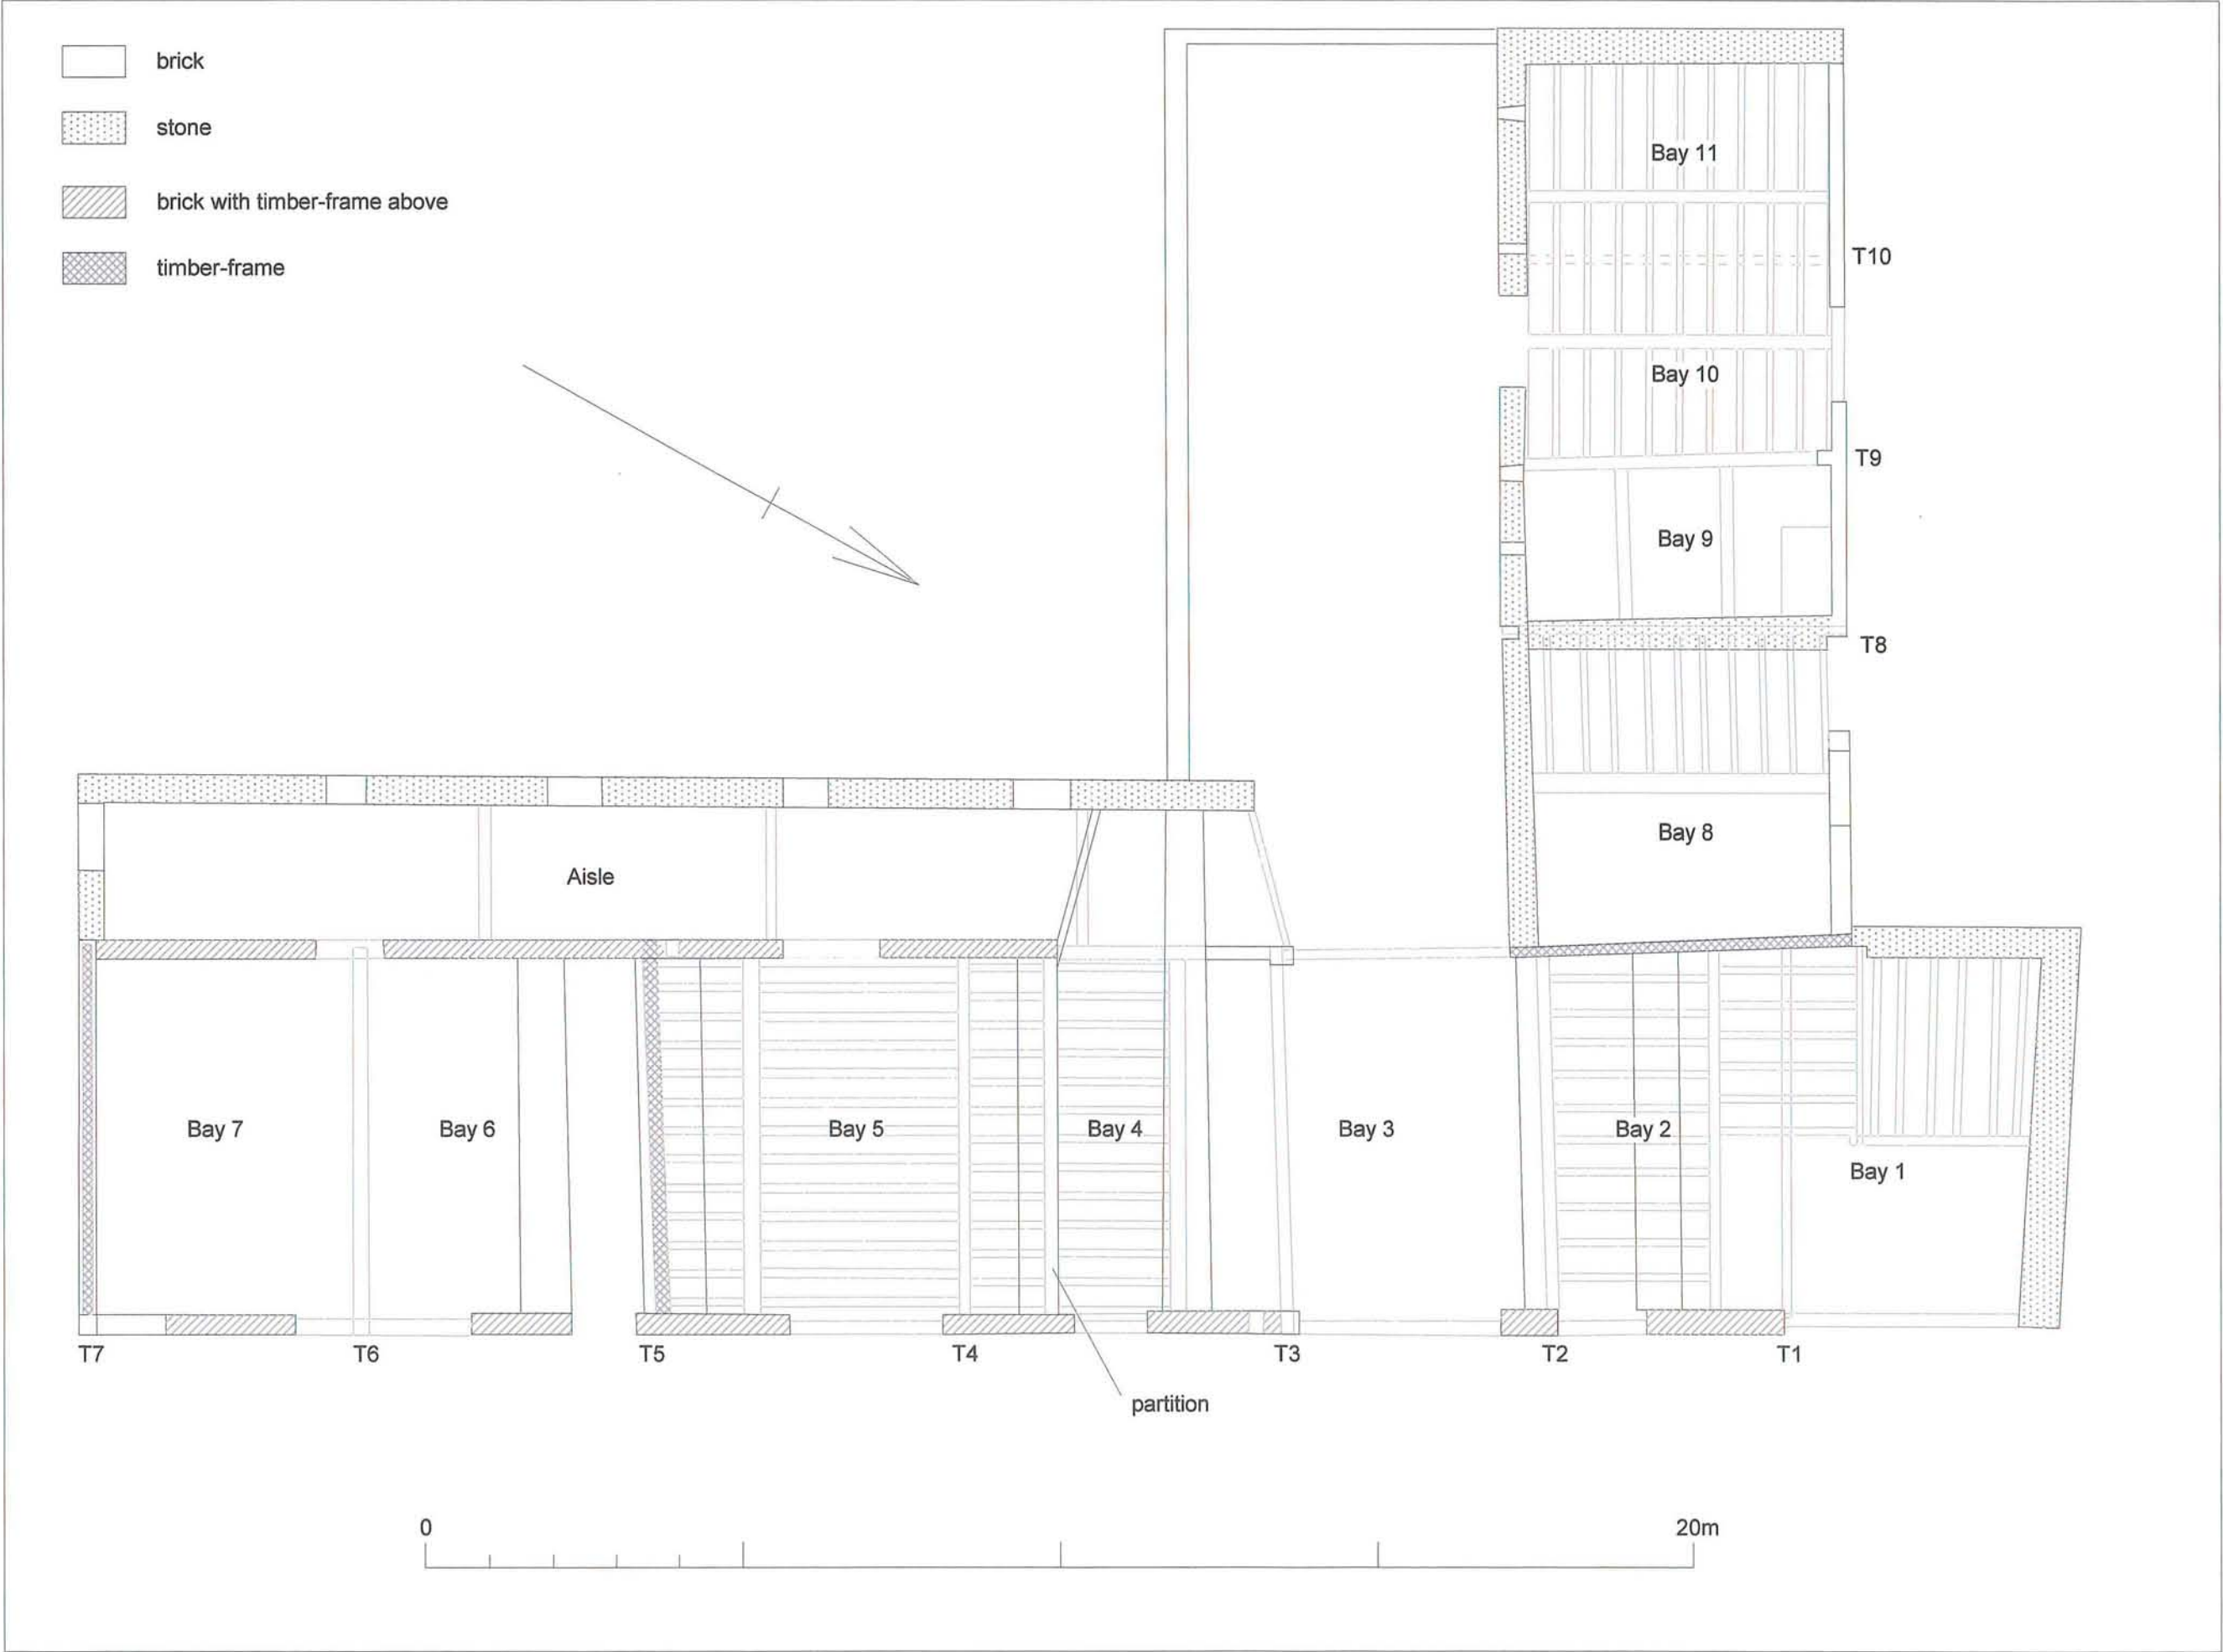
Barn 3 Ground Floor plan, scale 1:100
